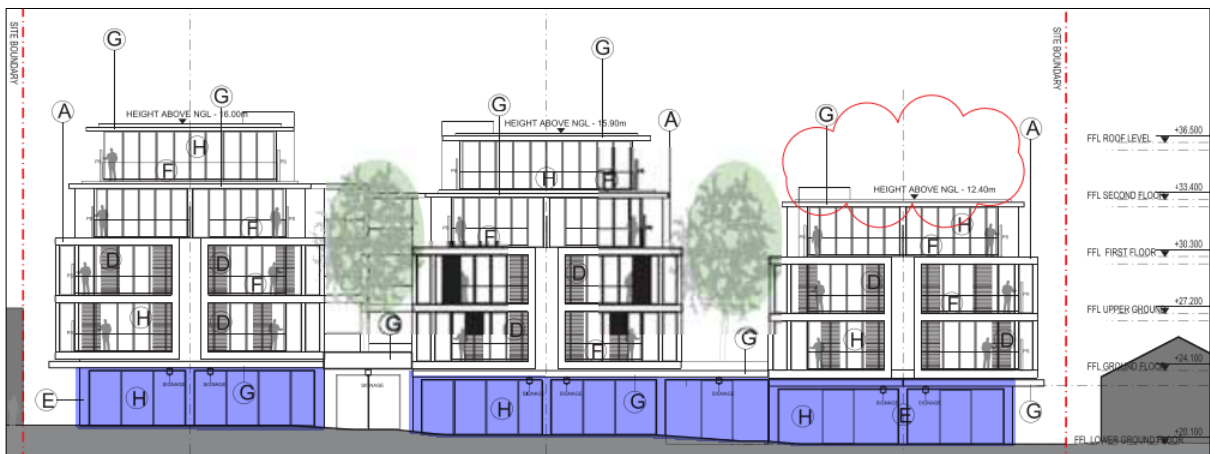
Proposed Newcombe Street Building Wings (Retail shown highlighted purple)
